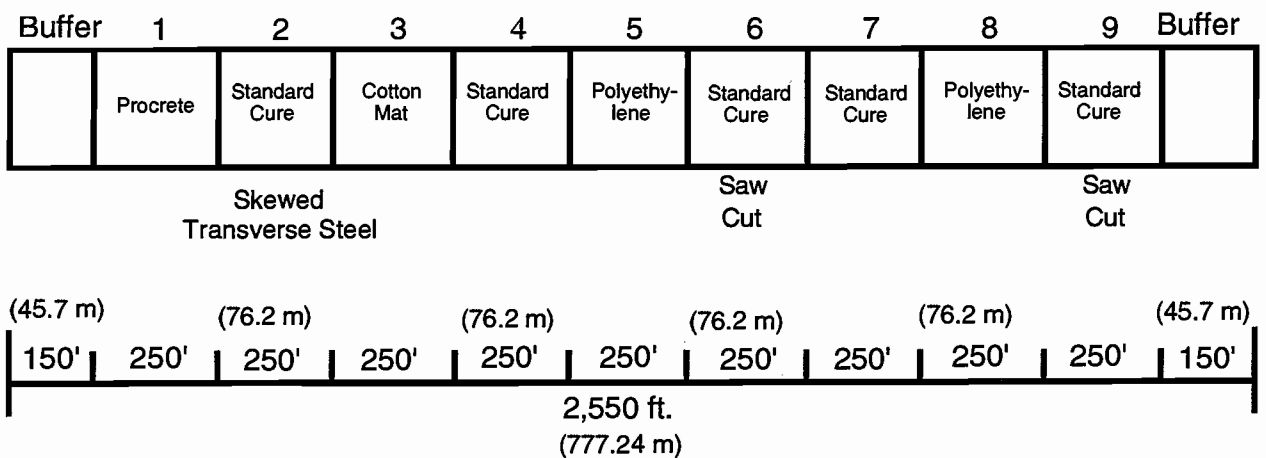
Layout of test sections by distance, cure type, and unique features
